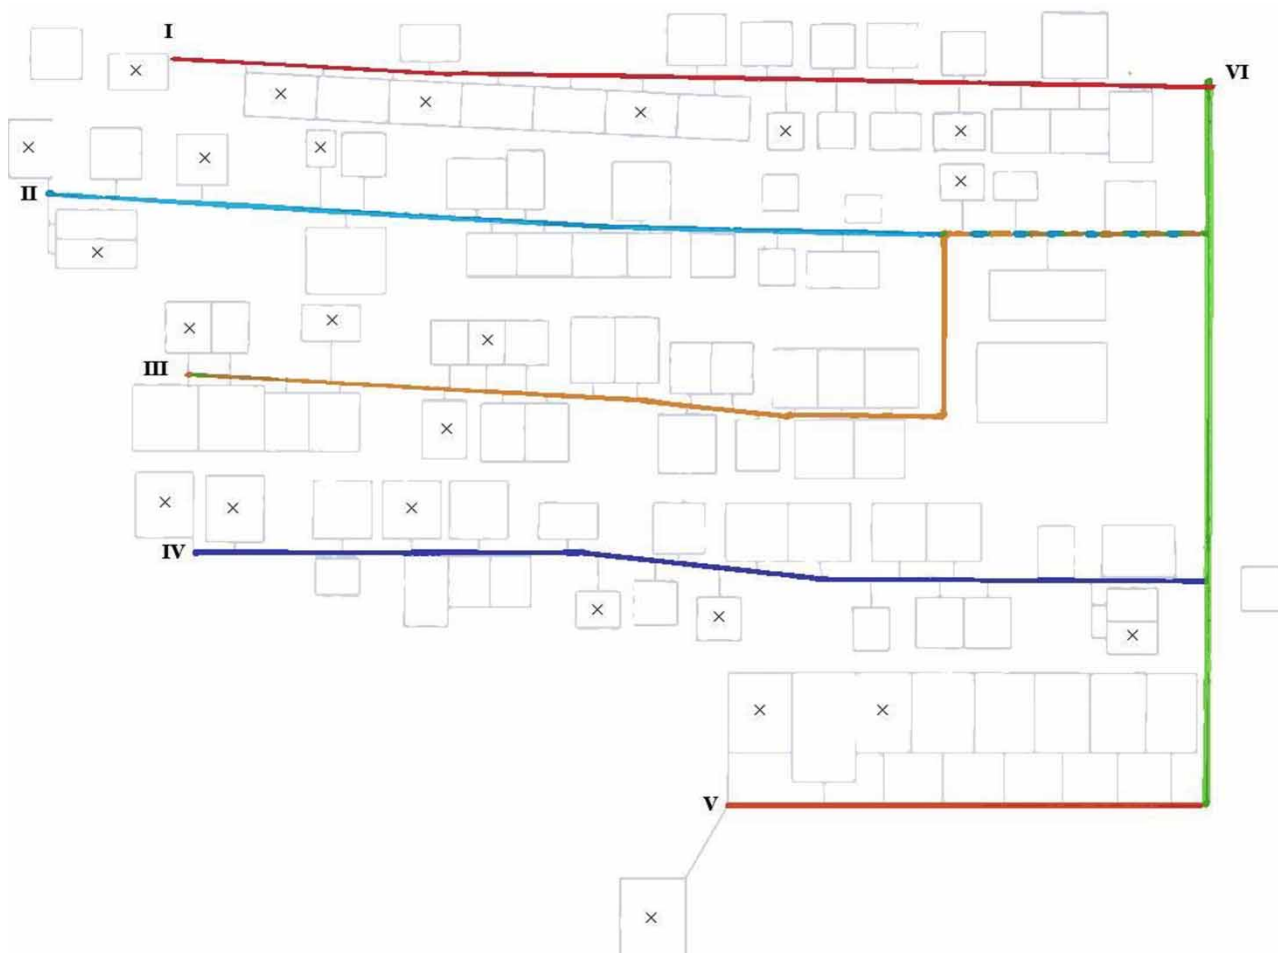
| Site layout showing proposed piped simplified sewerage network.
